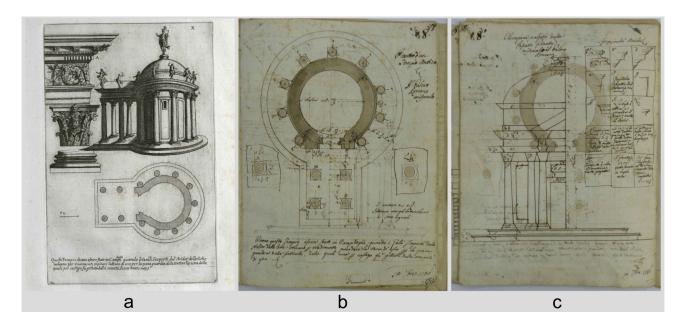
Tempio antico [in Campidoglio]: a) Montano's description: Montano 1684b, tav. X; b) GBC, plan; c) half section with details: Cipriani 1786-1791, cc. 13r, 13v.
